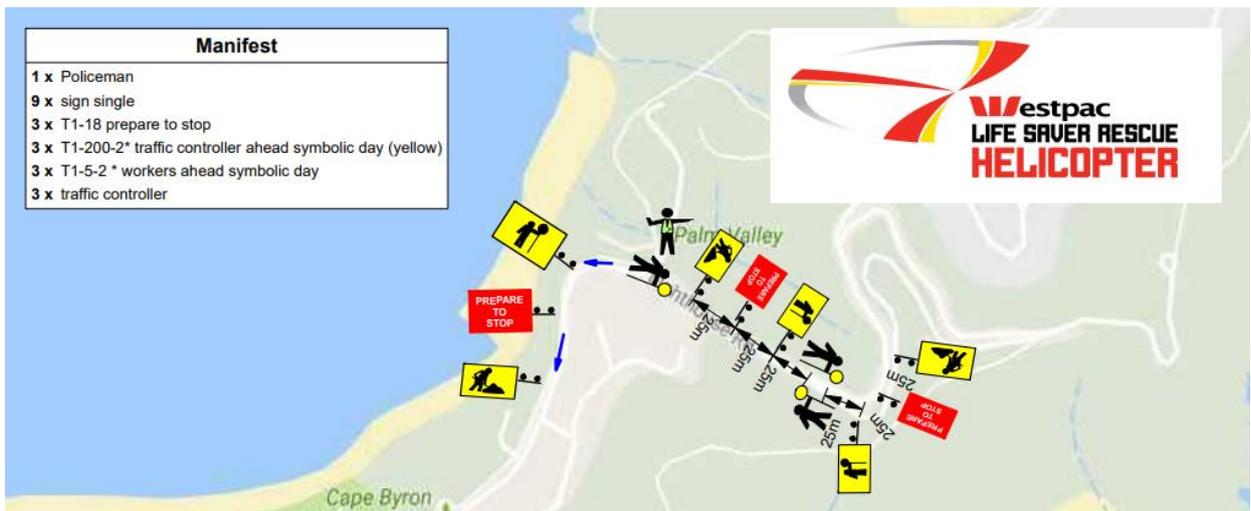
Traffic control proposed for eastern section Lighthouse Road. Coming down from Lighthouse Road (refer to Figure 1). Traffic control to be in place from 6am to 10.30pm.
